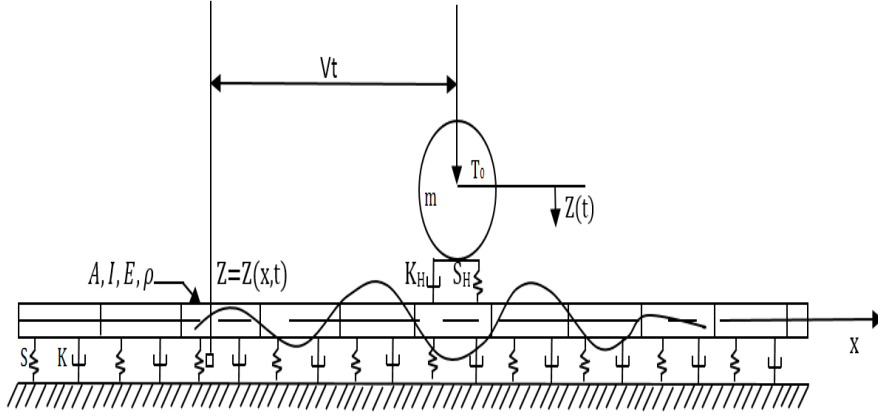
Winkler foundation using spring and damp for moving load in the railway road track showing the deformation of the beam [6]
